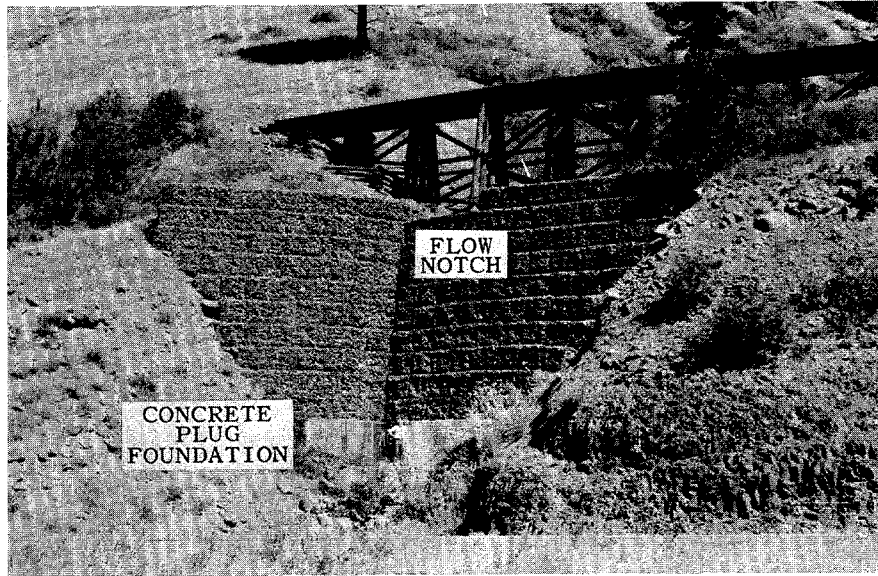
Gabion retaining wall in 1977, 6 years after construction.
